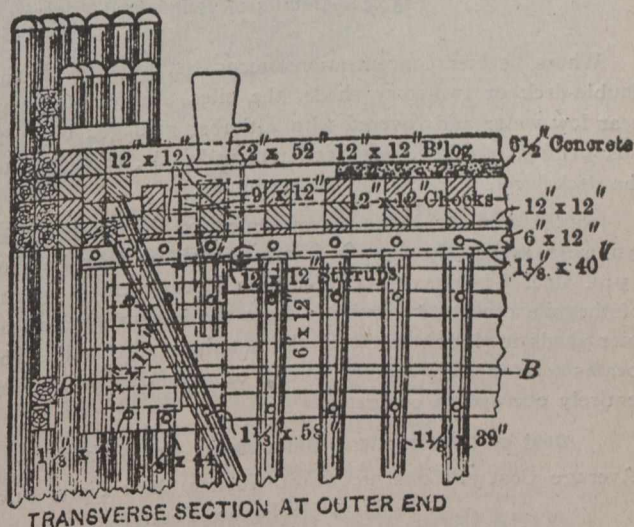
Pier Construction With Reinforced Concrete Deck.
